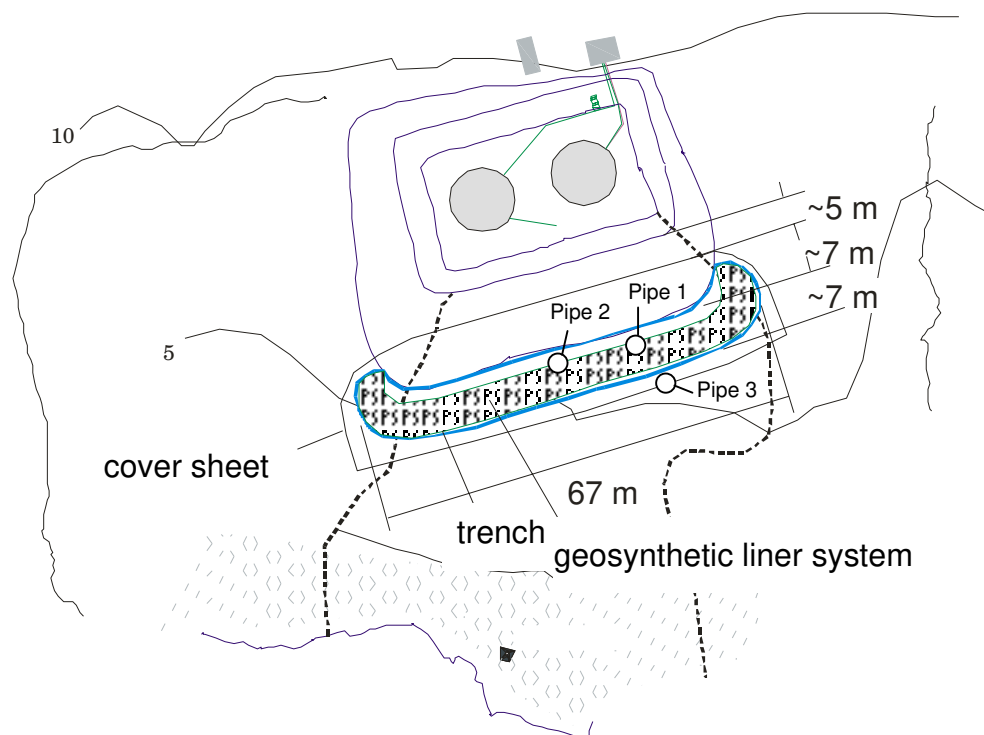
Plan view of containment barrier system location and instrumentation pipe locations.
